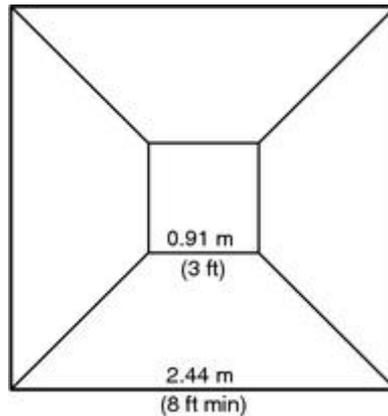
(b) Plan View of Canopy Head.
